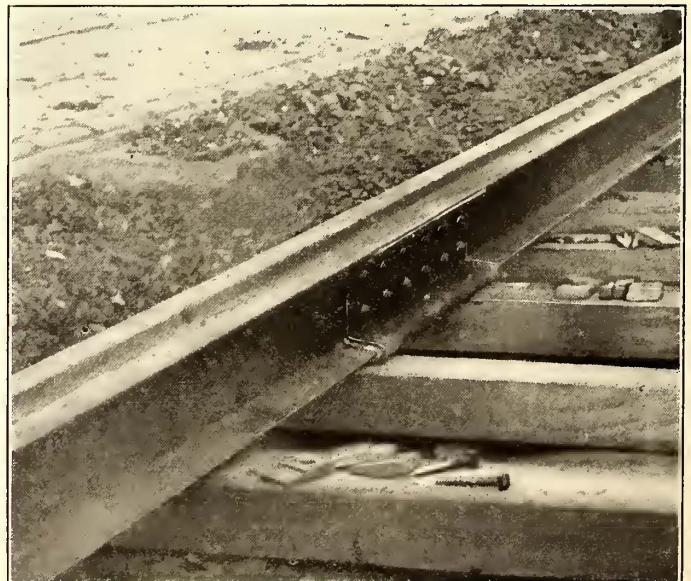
COMPLETED JOINT, INSIDE VIEW
